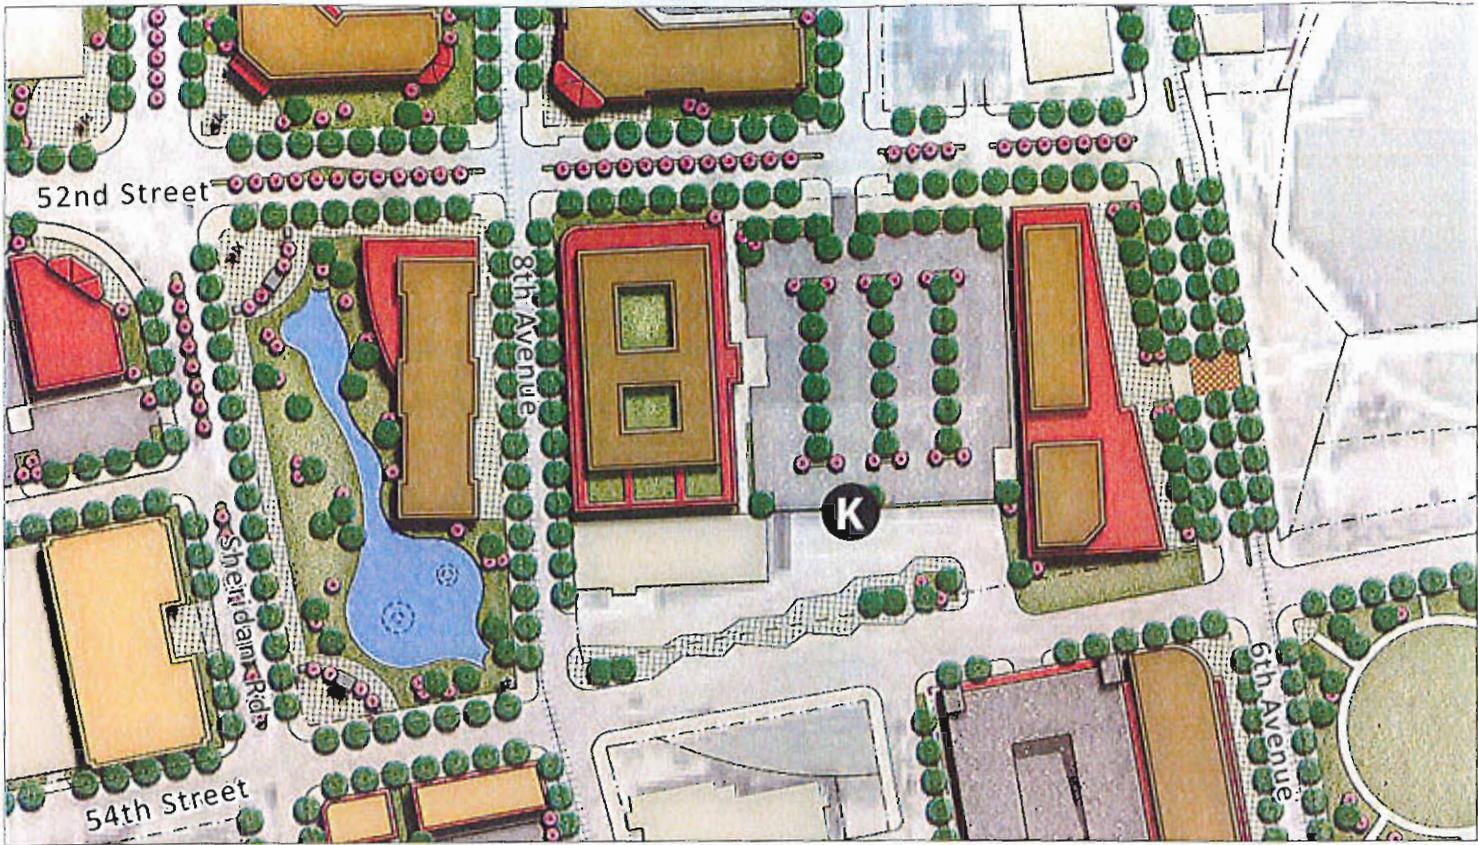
(top): Conceptual Plan for City Hall Redevelopment Site. Fig. 6-13 (bottom): Conceptual Plan Alternative for City Hall Redevelopment Site.
